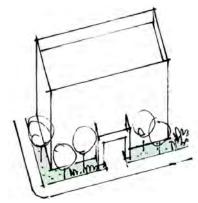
Mixed use area buildings with 5 to 15 feet street facing setback
